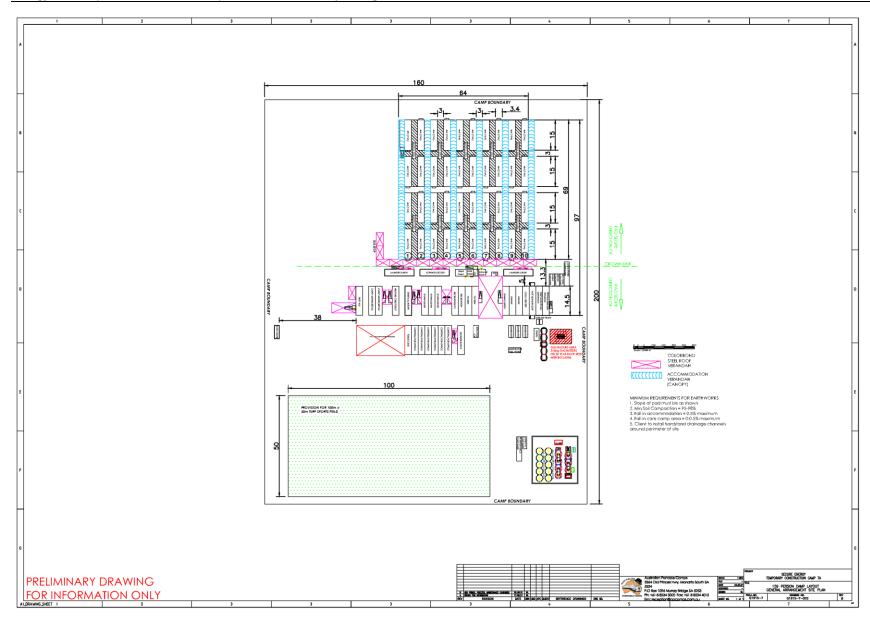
Indicative site layout of Wentworth accommodation camp
